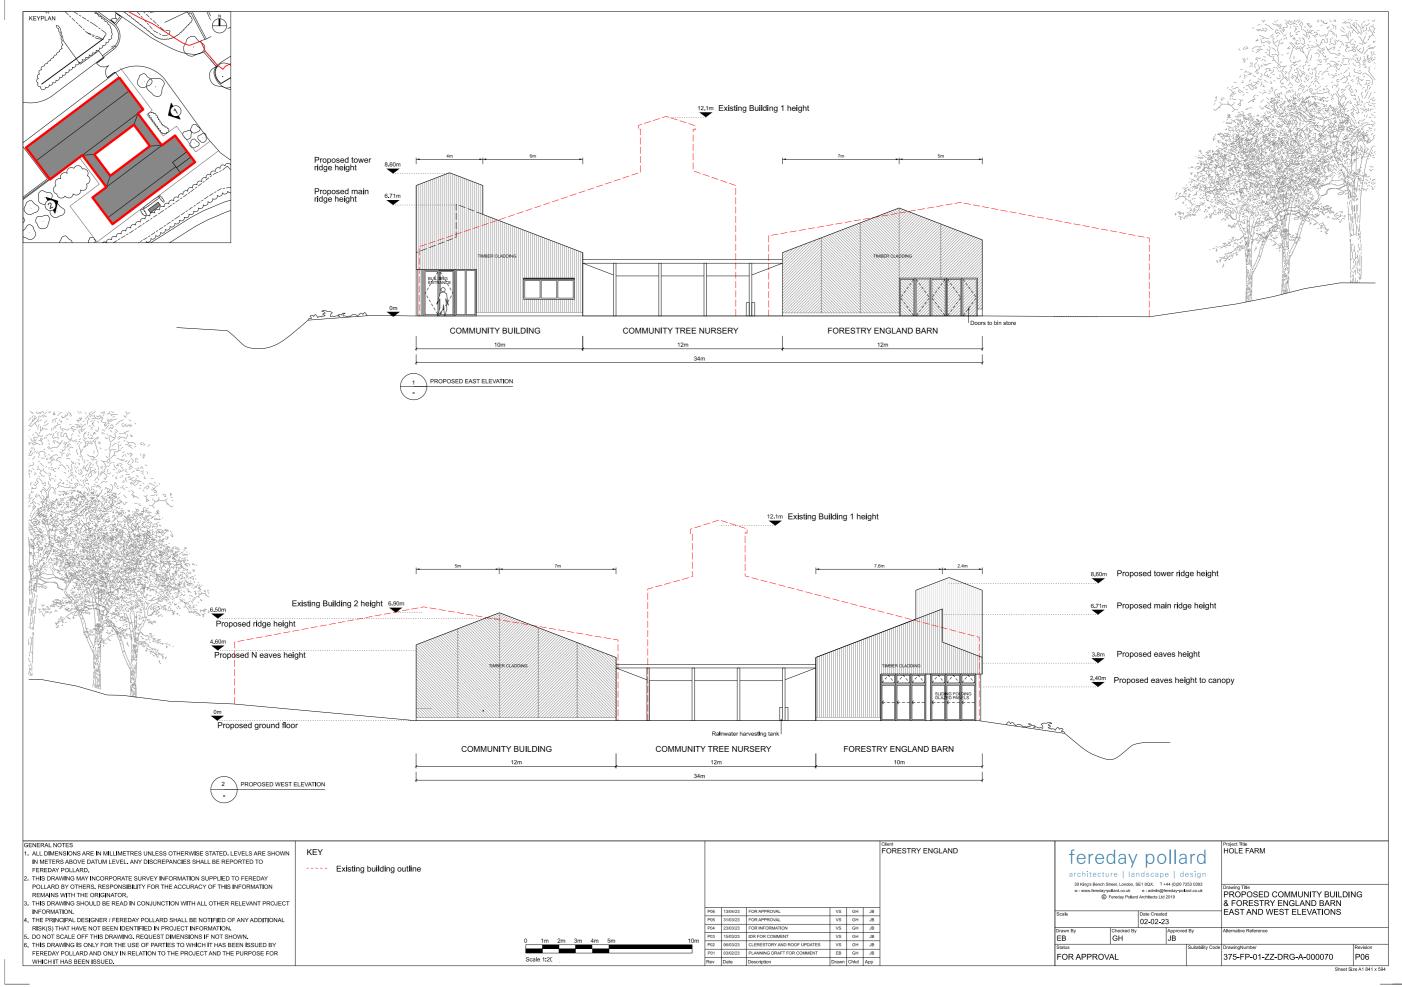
Proposed elevations of buildings replacing Building 1 and Building 2, showing outline of existing buildings in red
